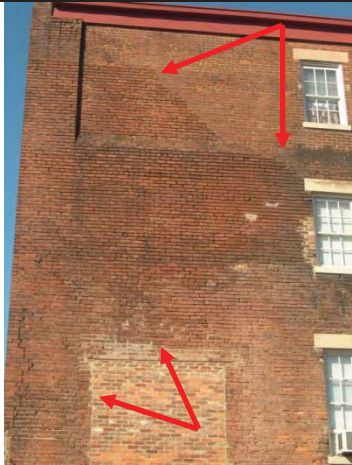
East-SE corner – 80% tuck pointing needed plus significant structural cracking
